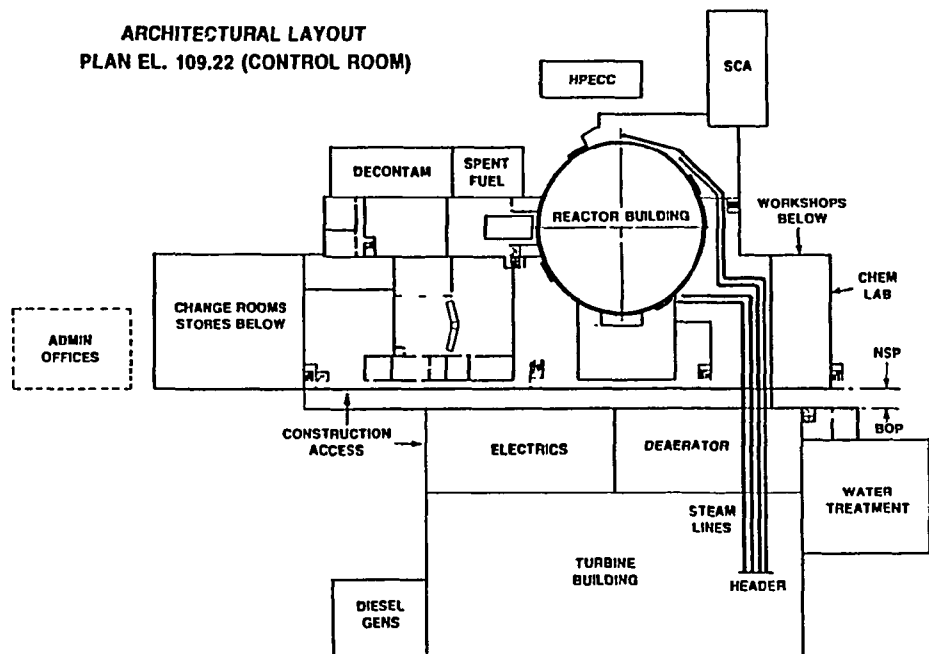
CANDU 6 MK 1 PLANT LAYOUT
